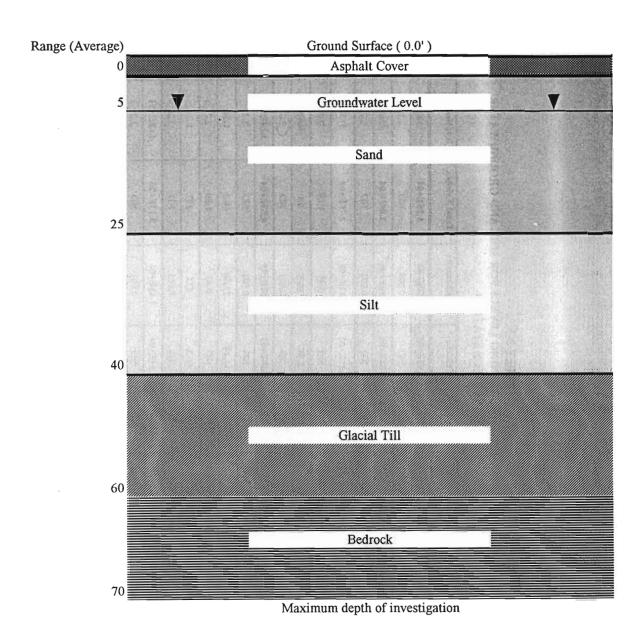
GENERALIZED SOIL PROFILE AT THE CENTRAL HEATING PLANT
